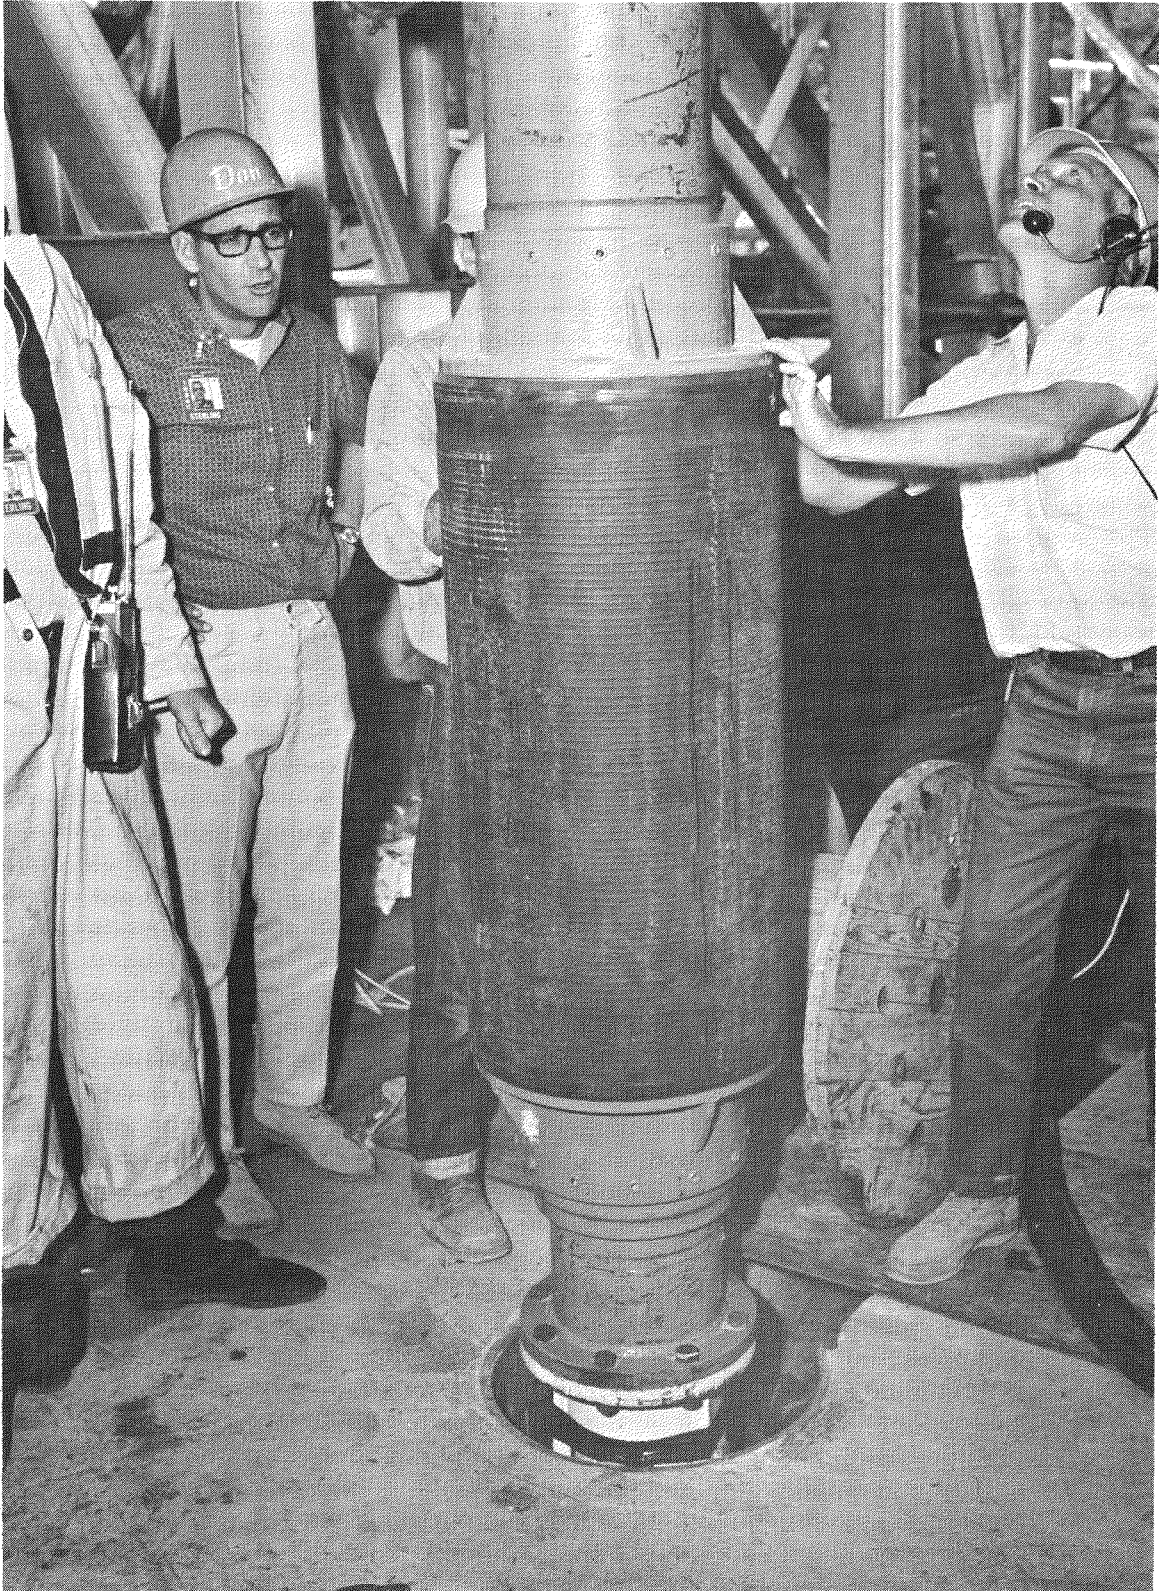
Lowering the Packer Assembly with the Device Cannister
